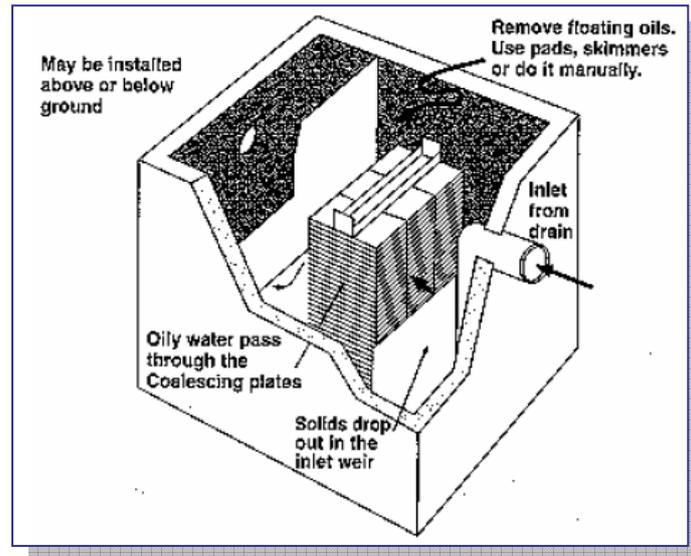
Coalescing Plate Separator (American Petroleum Institute)
